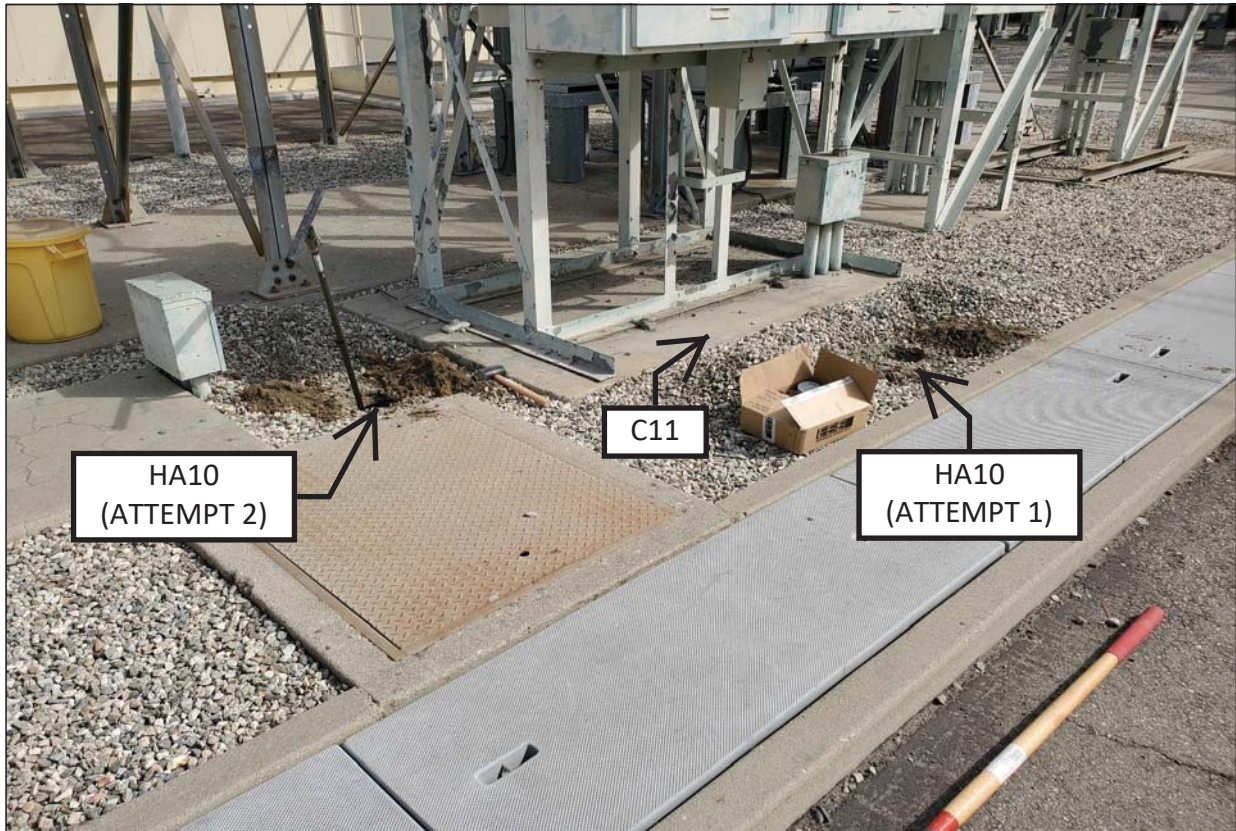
HAND AUGER SAMPLE LOCATION HA10 (2 ATTEMPTS) AND CONCRETE SAMPLE LOCATION C11
